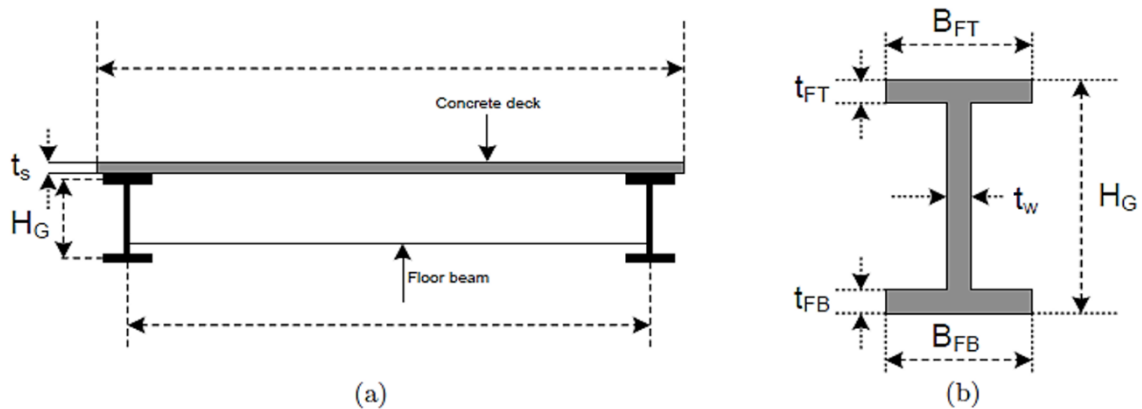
(a) Cross-section of the bridge deck and (b) Steel main girder
